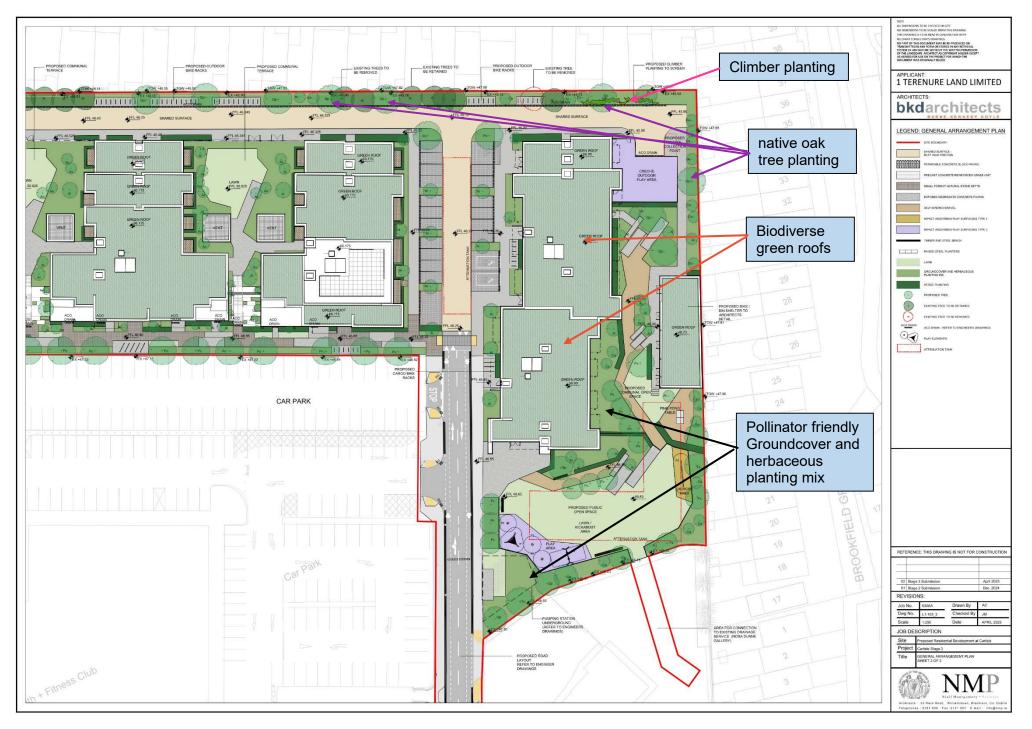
Proposed Landscape and Green Roof Plan – sheet 2
